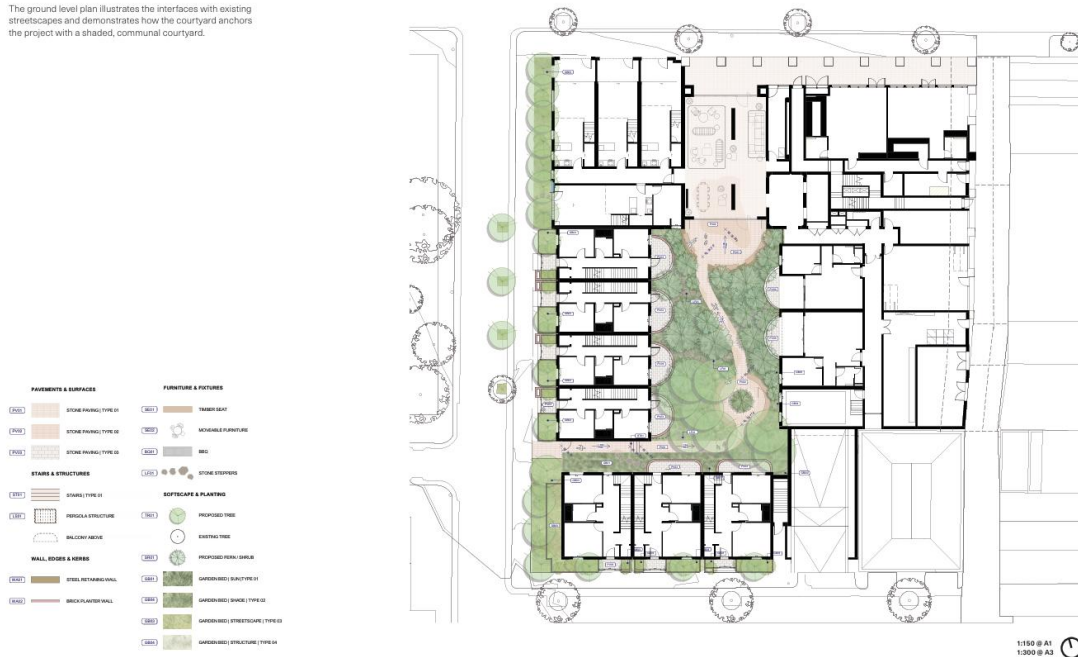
Ground floor – Landscape Concept Plan – Source: Application
